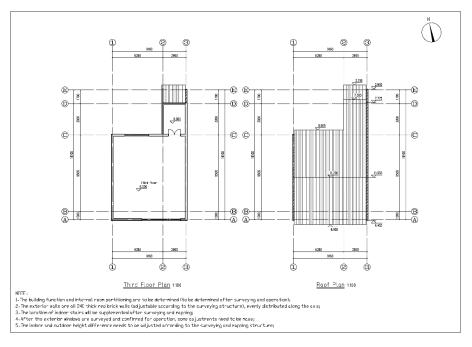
The Third Floor Plan and Roof Plan of Sample Building No. 1 (Drawn by the author)
